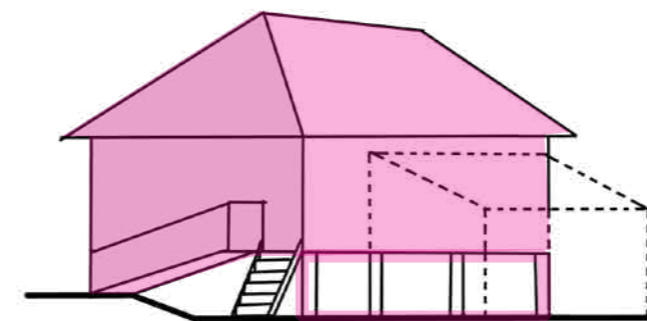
Core space arrangement (multiple rooms, 5mx5m, floor raised but not too high to allow for a ramp; hipped roof; dotted line shows possibility for future extension).
